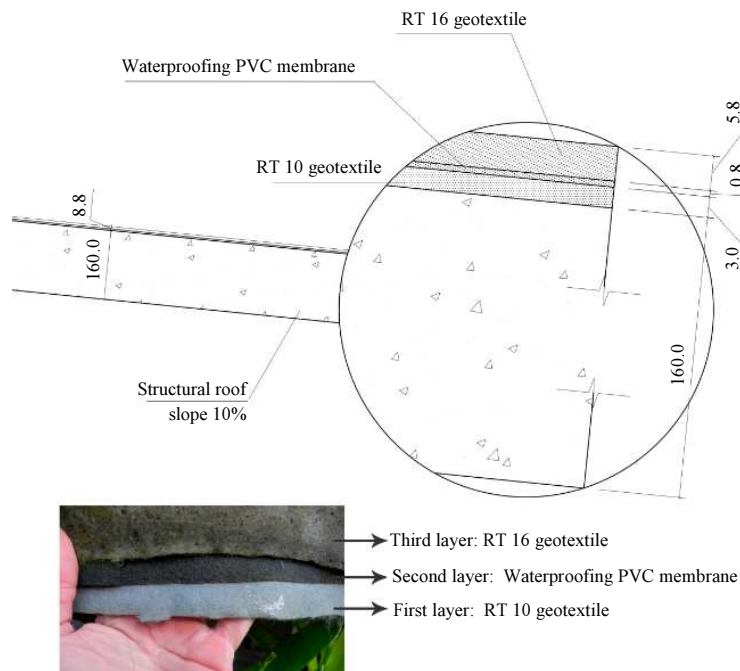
Detailed roof cross section of a three layered tropical greenroof technique. Cross section of roof covered by the three layers that are responsible for waterproofing and rooting media (all dimensions in mm) and picture of the three layers
